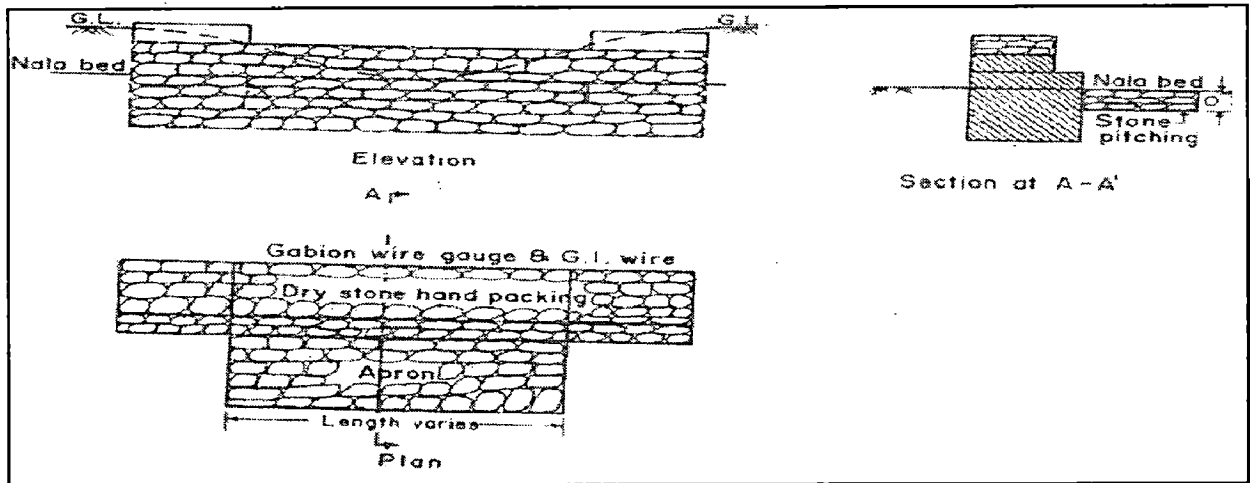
(b) Plan, Elevation and Cross Section of a Gabion Check Dam (GCD)
